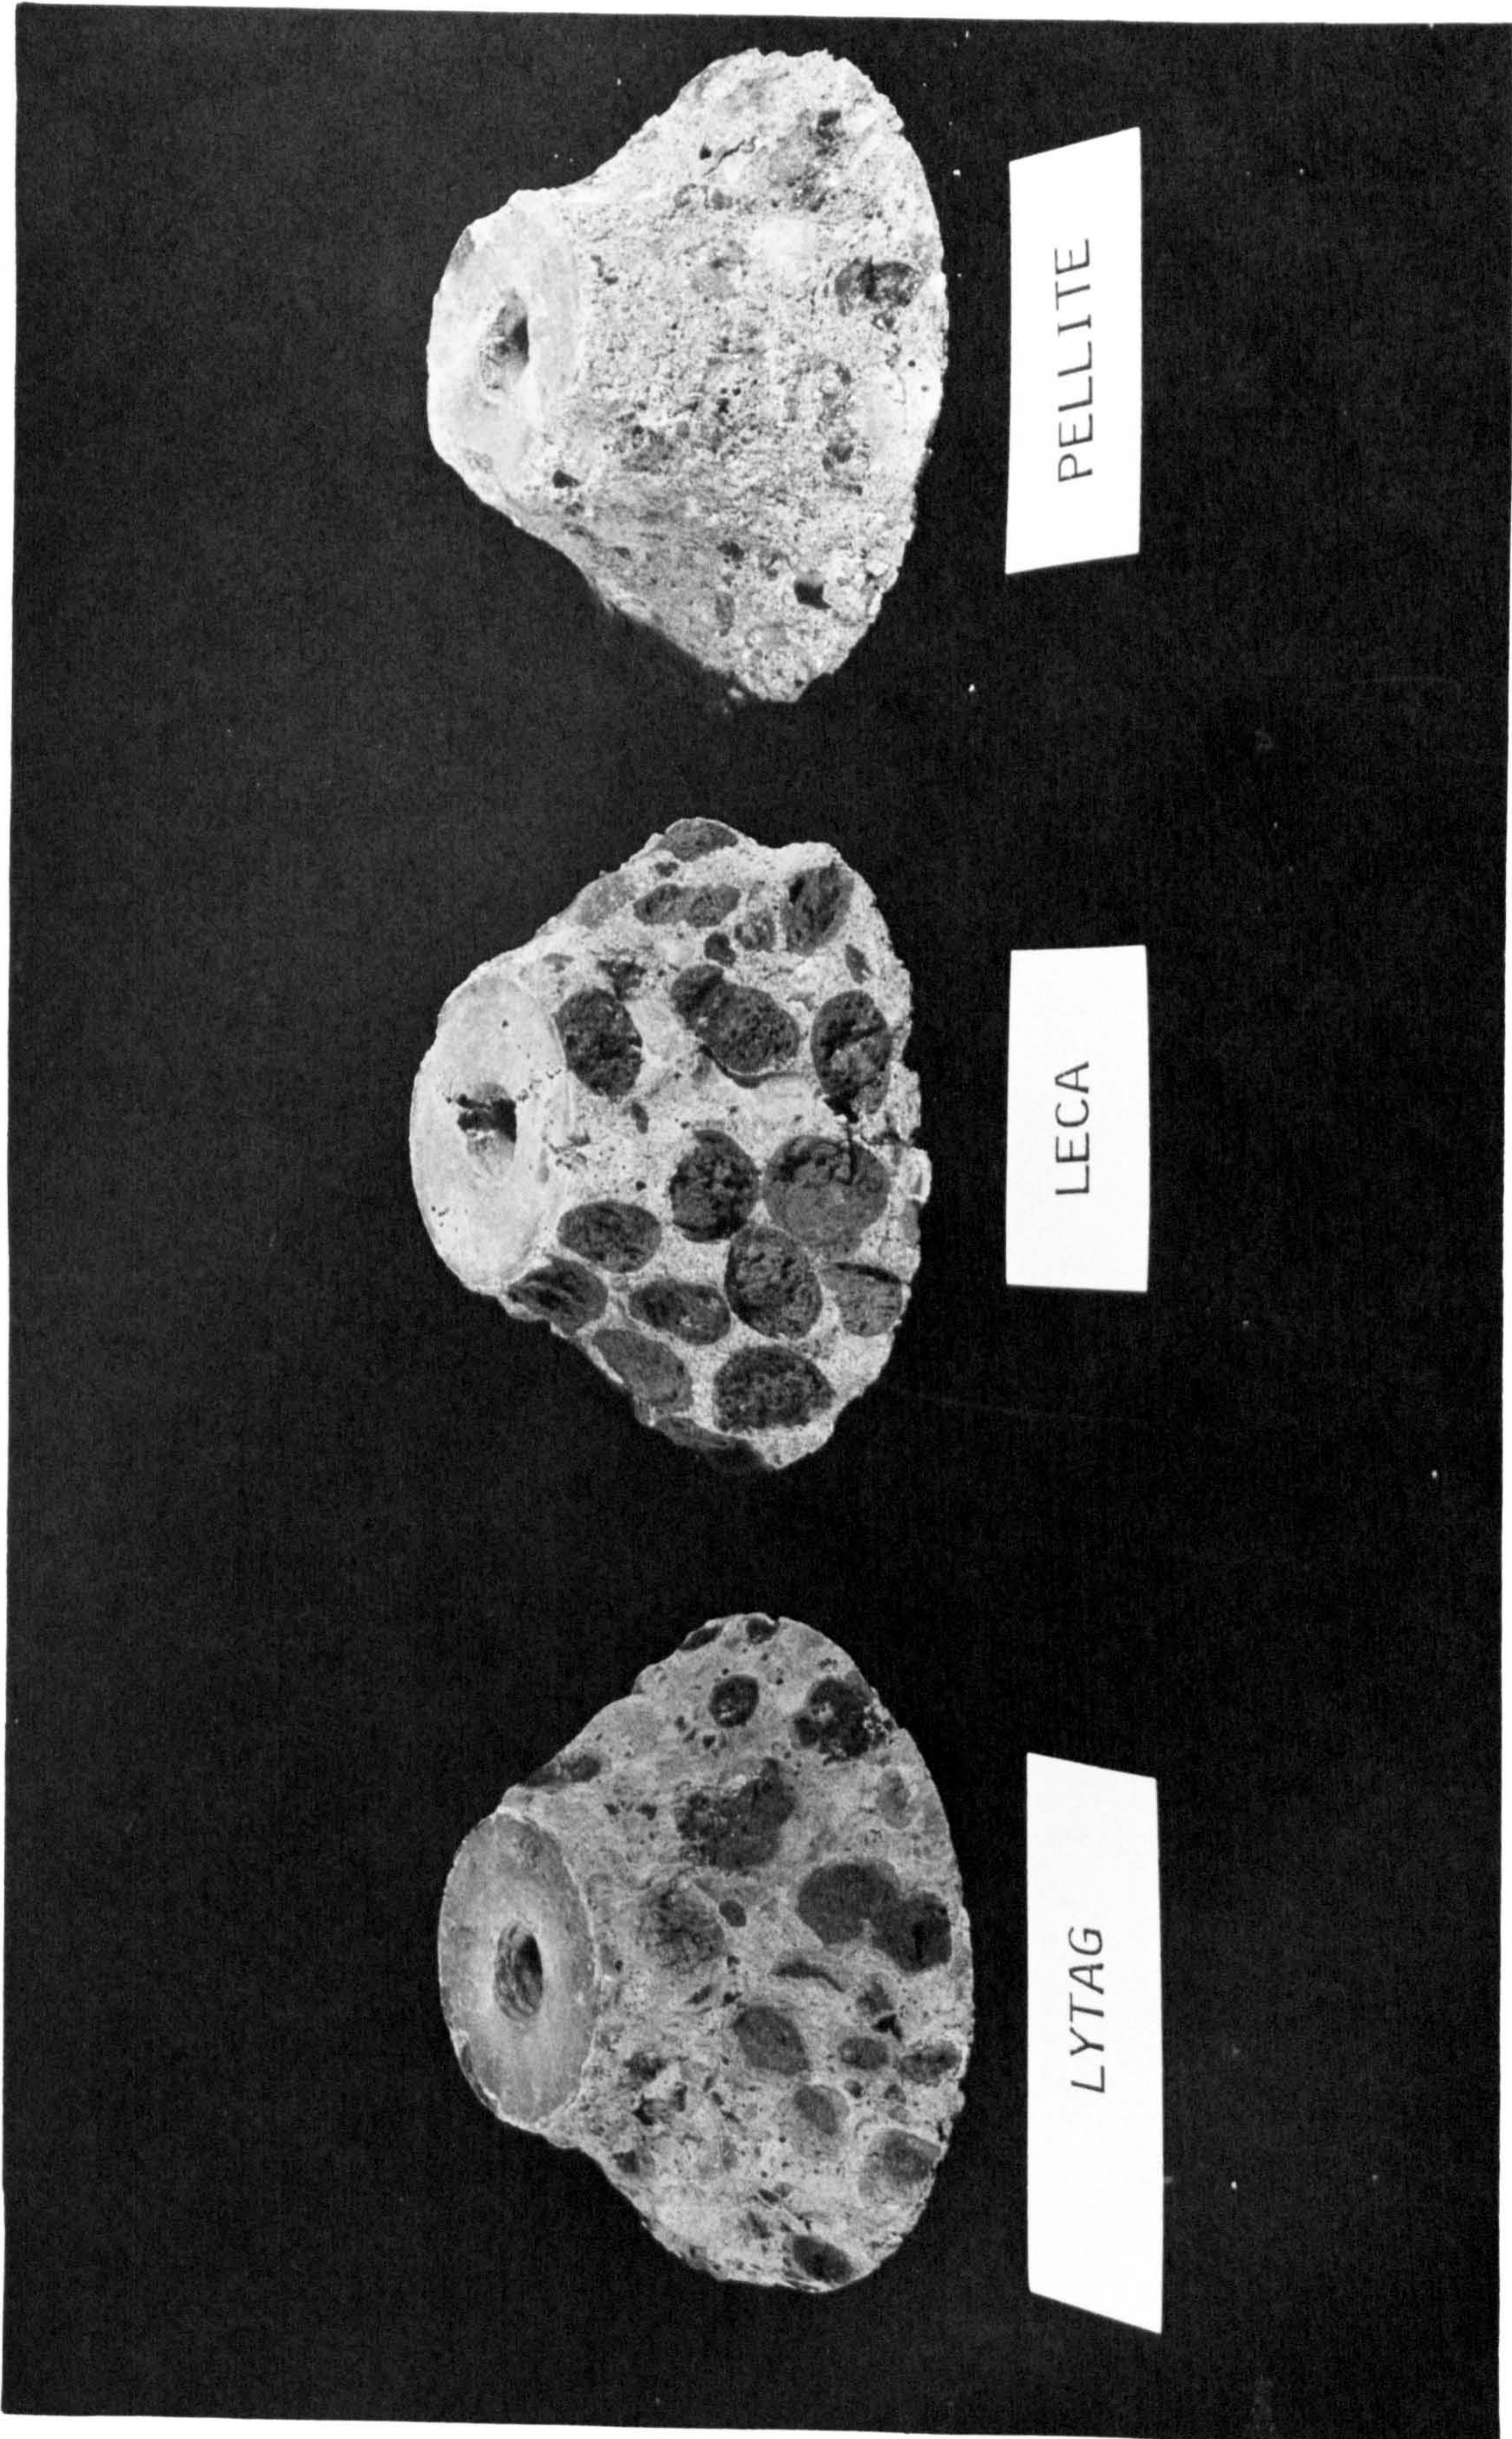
Typical truncated cones of lightweight concretes extracted through the pull out tests
